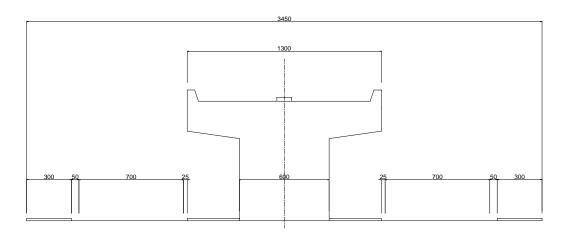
Typical Cross Section of Flyover Section (Alternative A)
